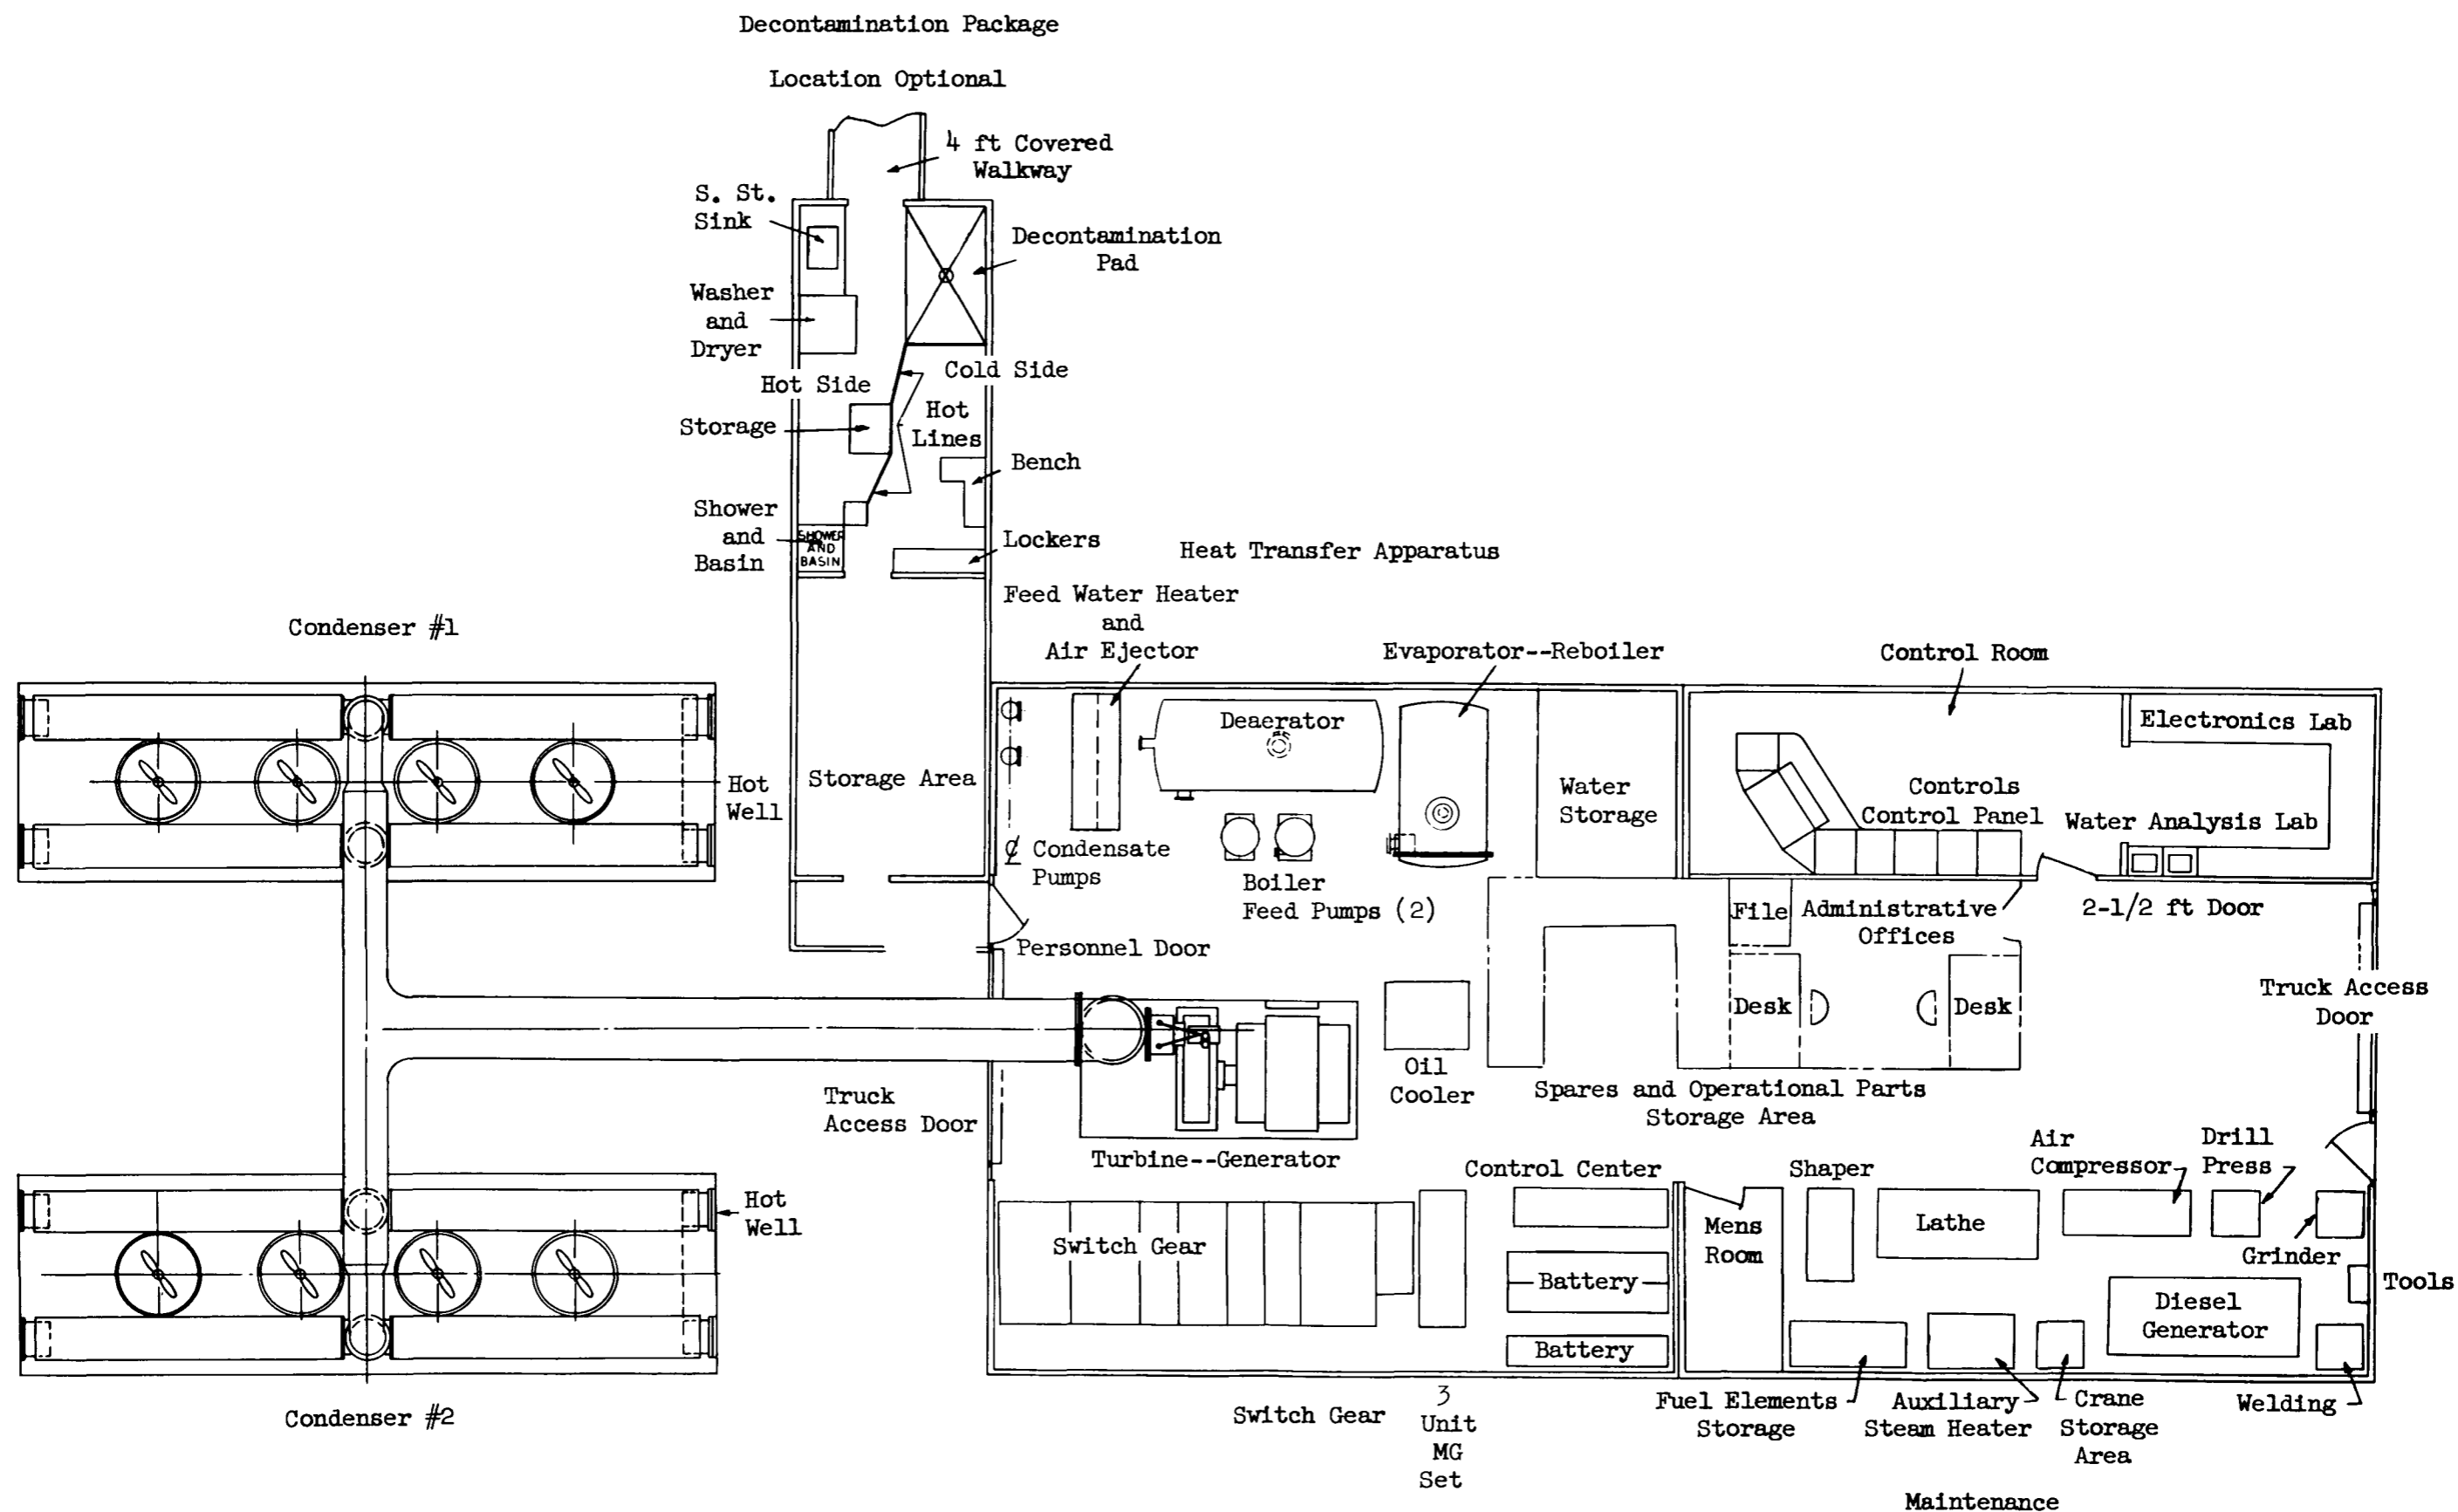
Plant Layout, Secondary System--PM-1 Power Plant
